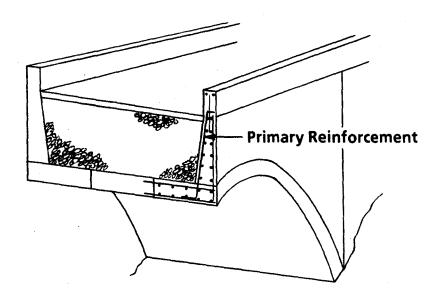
Reinforcement in a Closed Spandrel Arch
